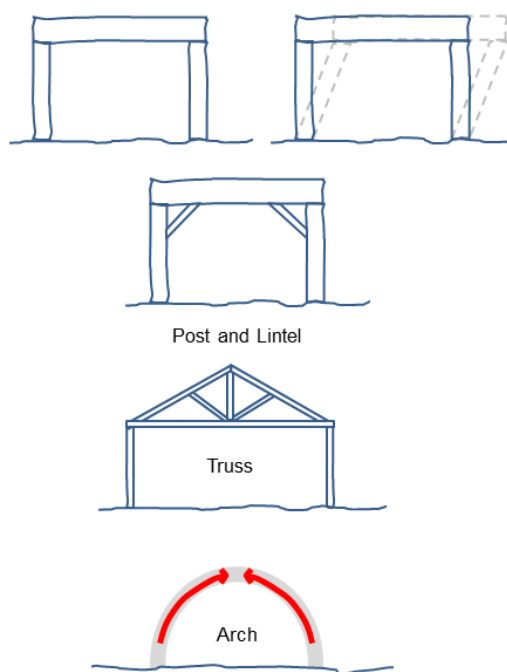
Structural systems: Post and Beam, Truss, and Arch
